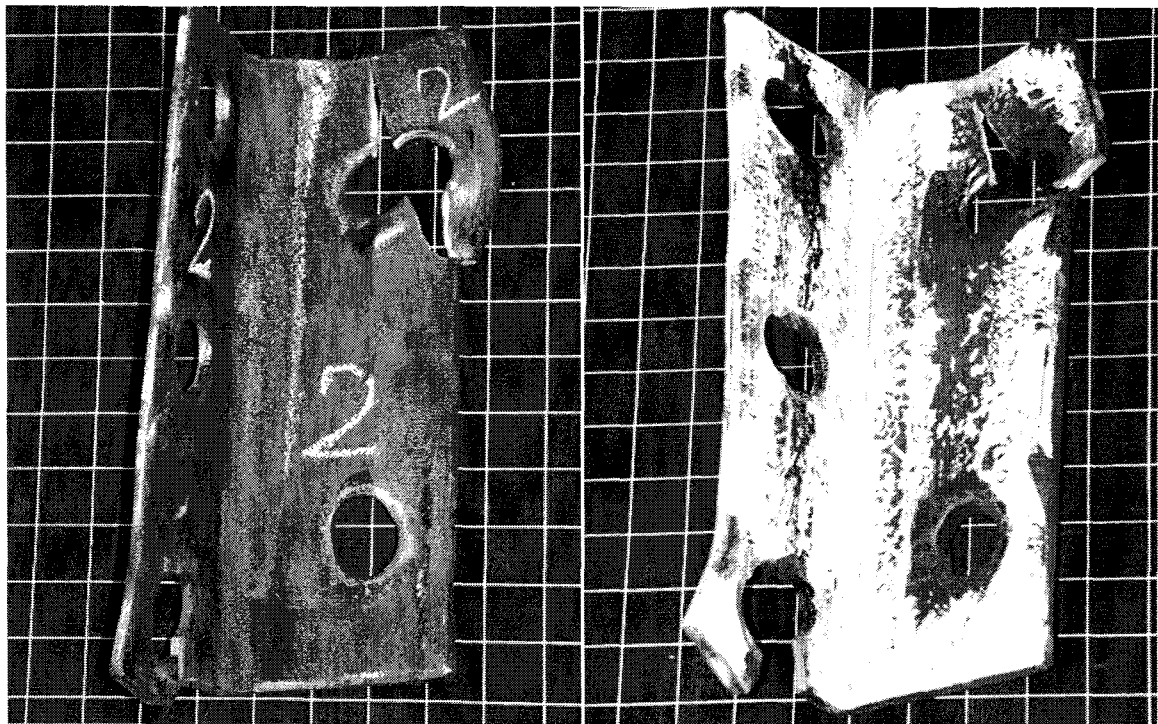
Tension and Shear Block Failure of Coped Beam Web
